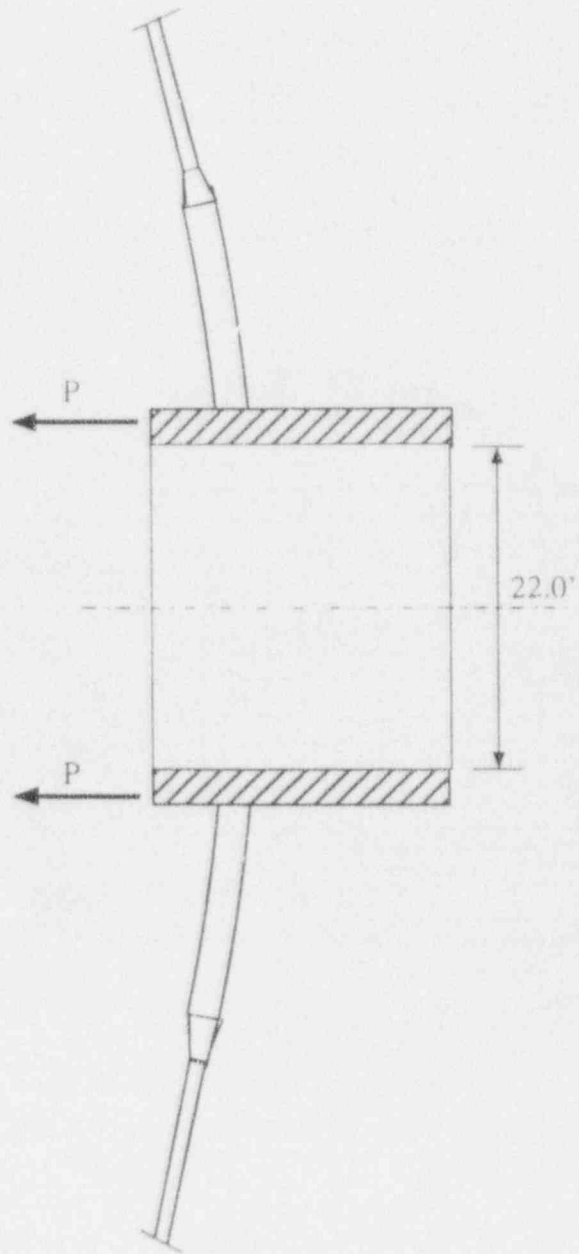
Reinforced Opening with Ring Load (Load Case 3)
